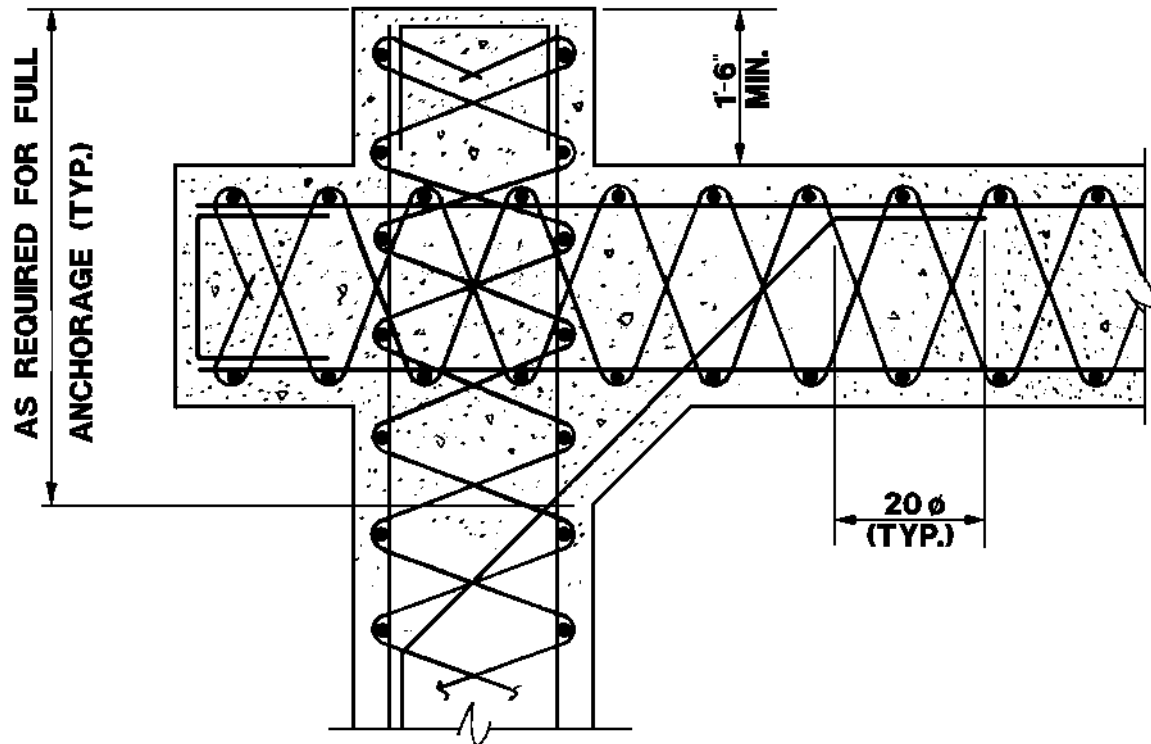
Intersection of Continuous and Discontinuous Laced Walls Without Wall Extensions
